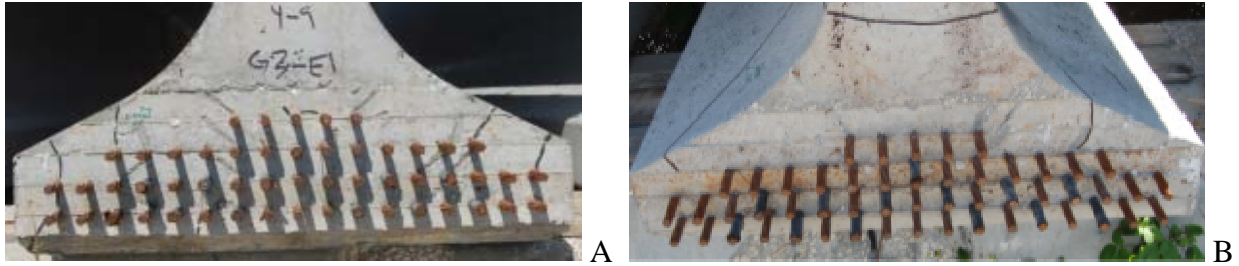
Girder D flange splitting cracks in A) specimen DC and B) specimen DM
